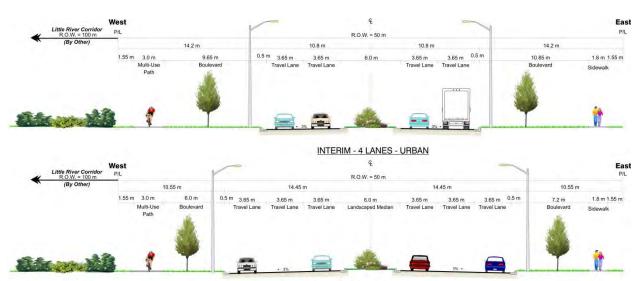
PIC 2 TYPICAL CROSS-SECTION LAUZON PARKWAY COUNTY ROAD 42 TO HIGHWAY 401
